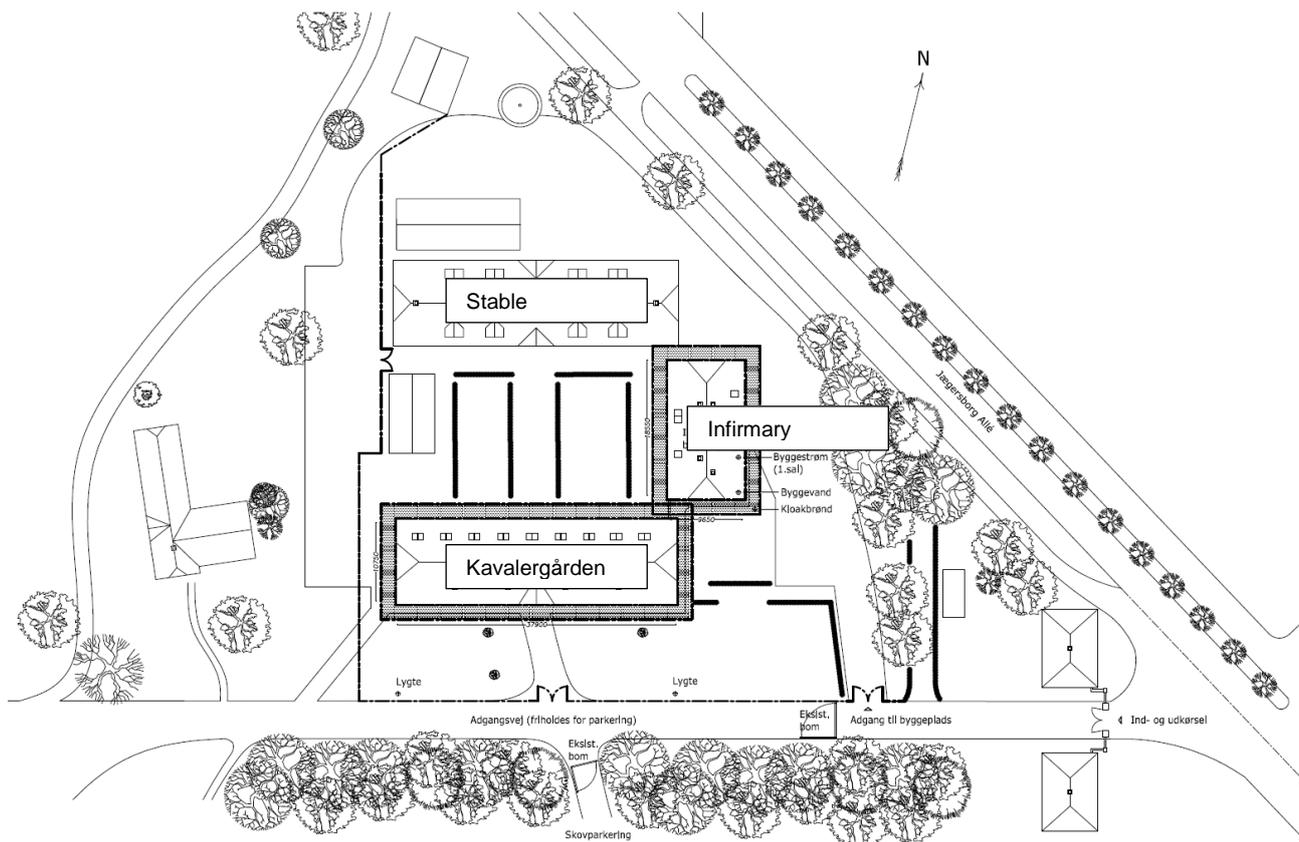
Site plan of Kavalergården (building site plan from refurbishment 2011), indicating scaffolding on two buildings.
